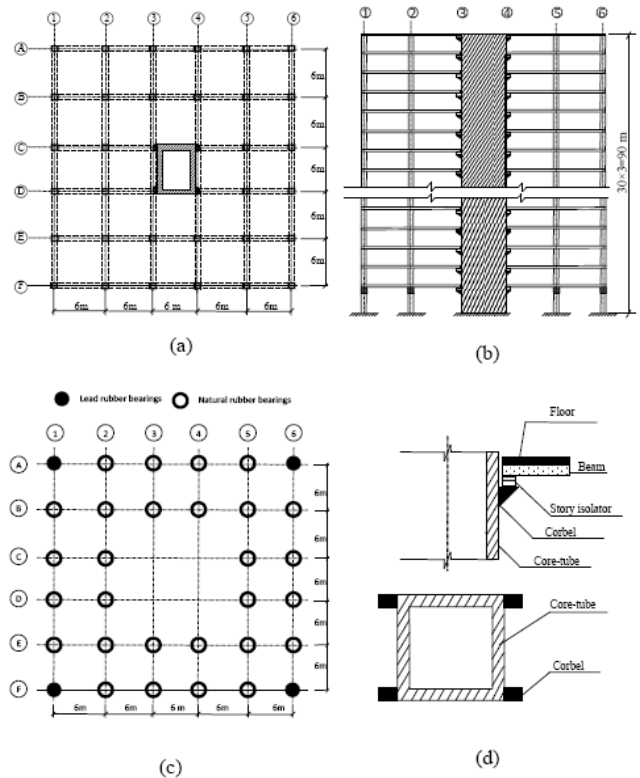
Arrangement of fixed-base core-tube and base-isolated frame structure: (a) Typical plan (b) Elevation (c) Base isolators (d) Storey isolators connected to core-wall
